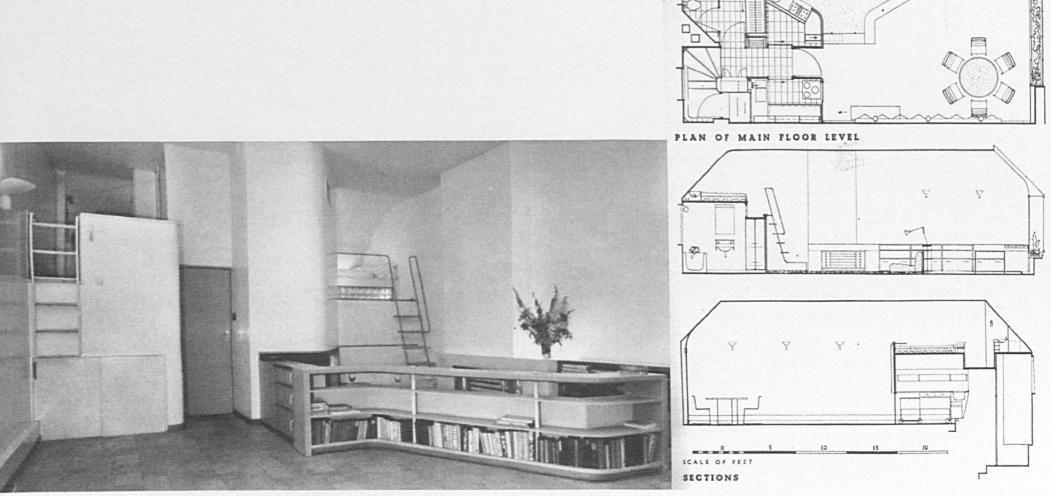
Sleeping areas with ladder access; right: plan and sections. 2-1 section, 18 Yeoman's Row, London
